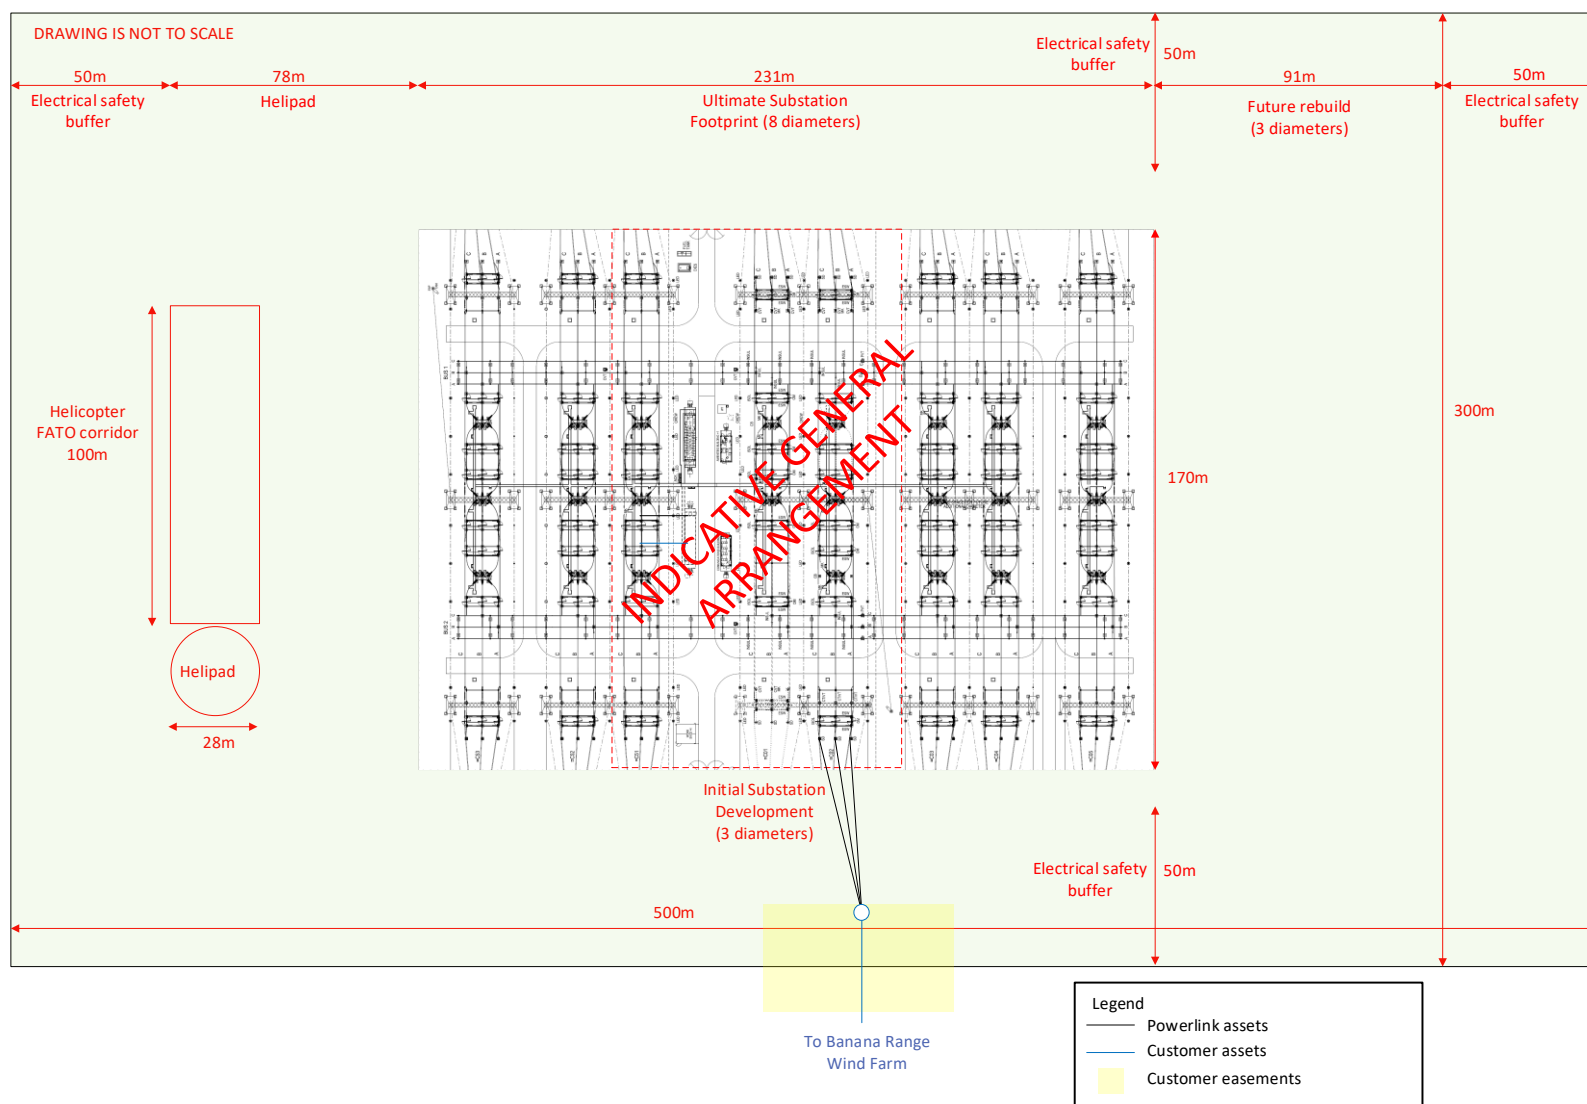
B Substation general arrangement (the proposed Mount Benn Substation)
